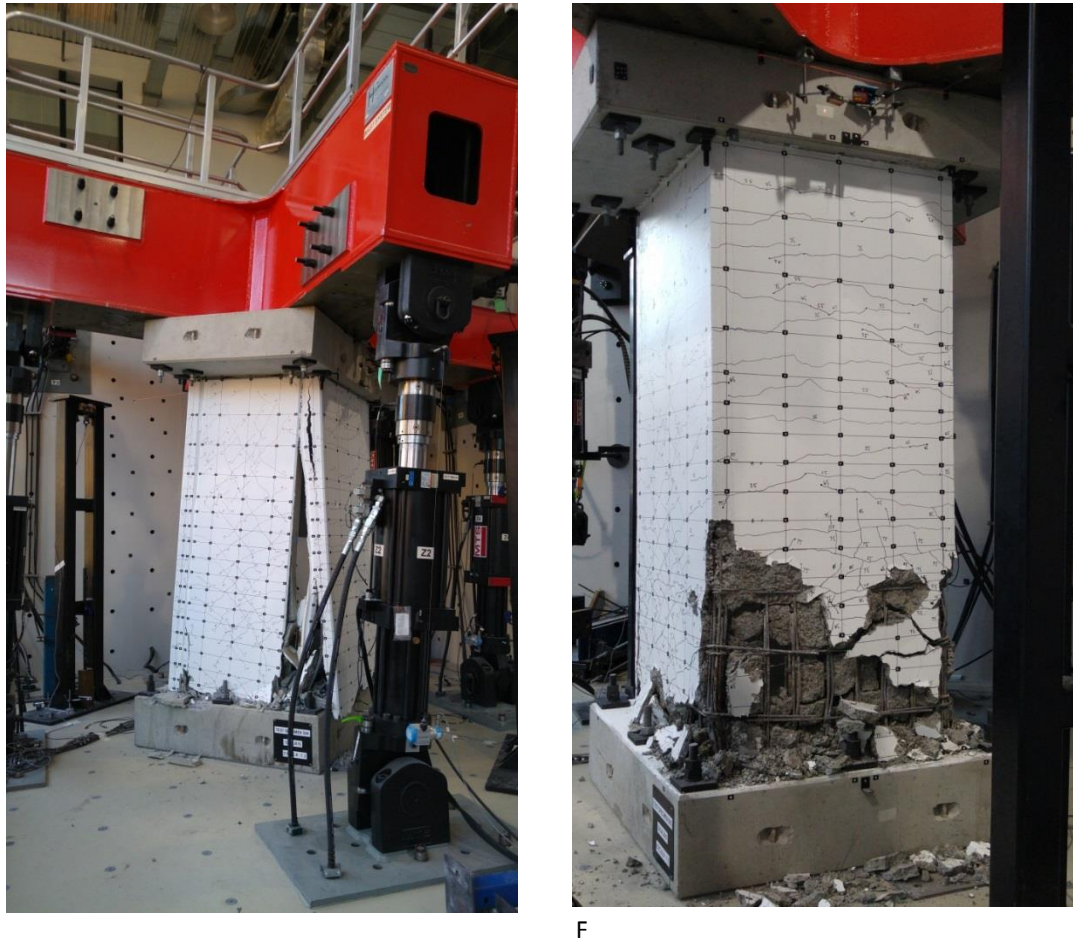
(left) Failure mode of RC core wall with construction joints between precast wall panels, (right) failure mode of cast-in-situ monolithic RC core wall
